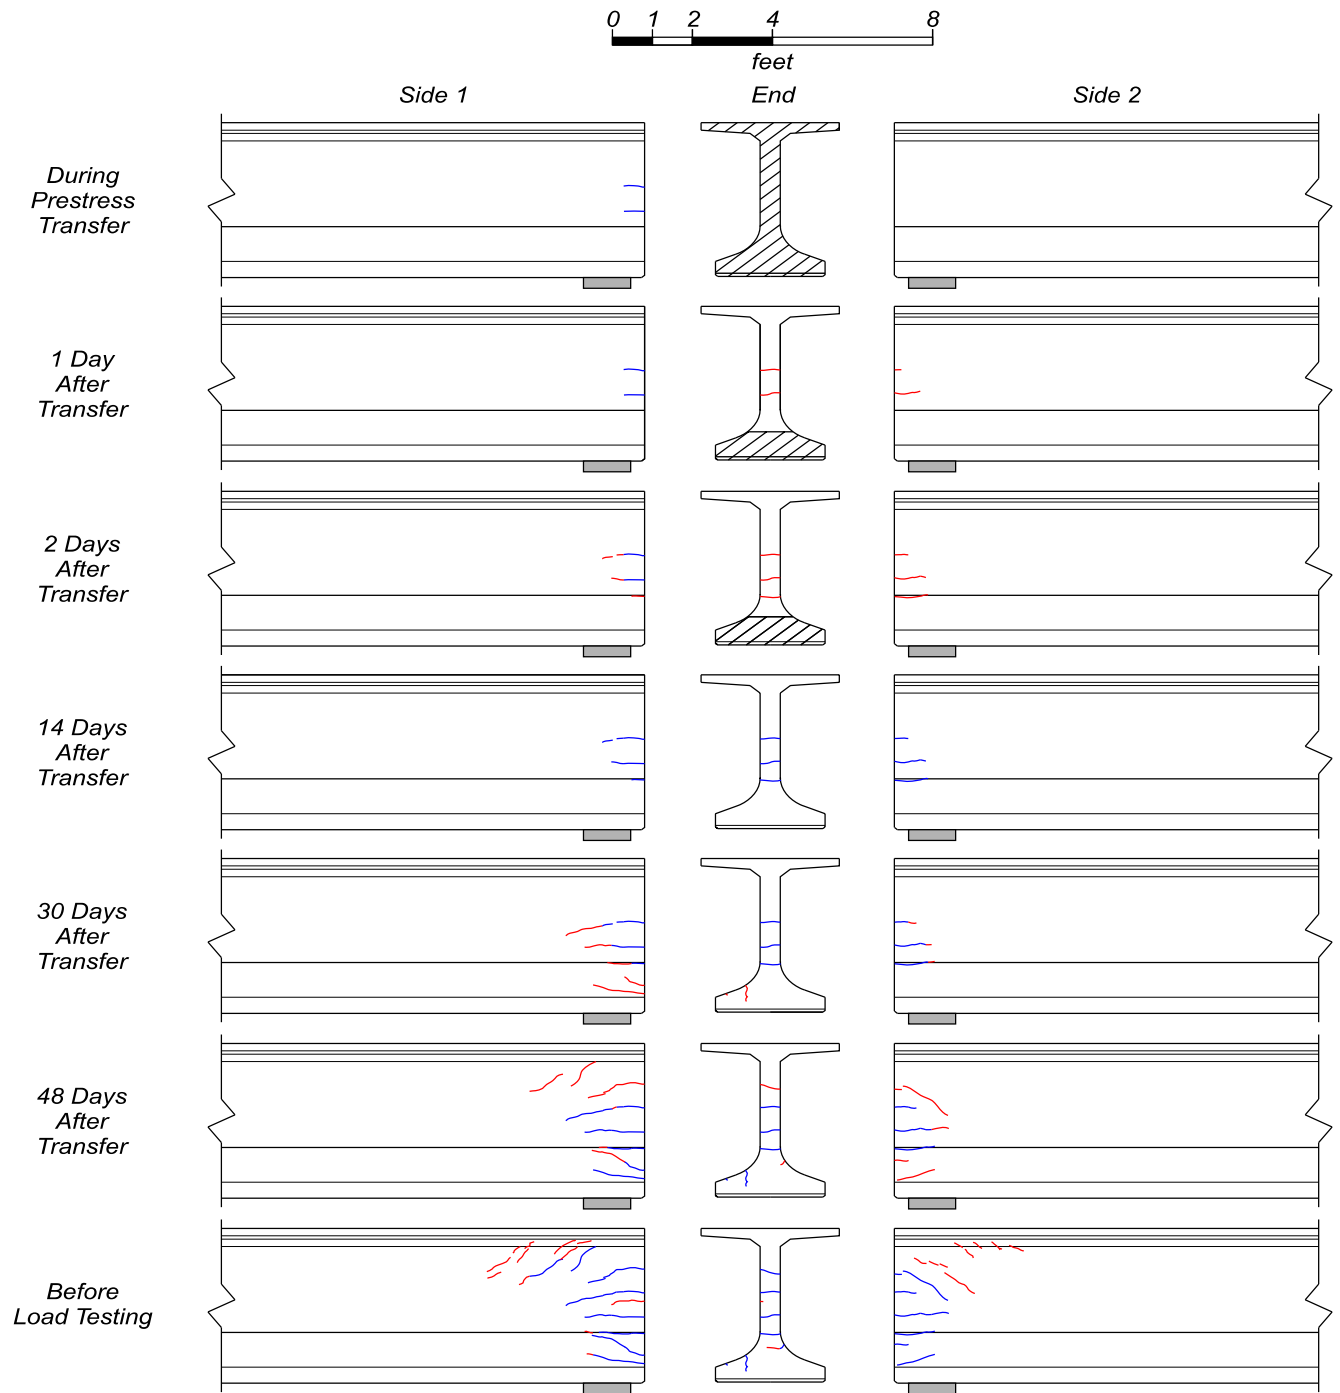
Crack growth in specimen SL (flexural cracks in top flange not shown)
